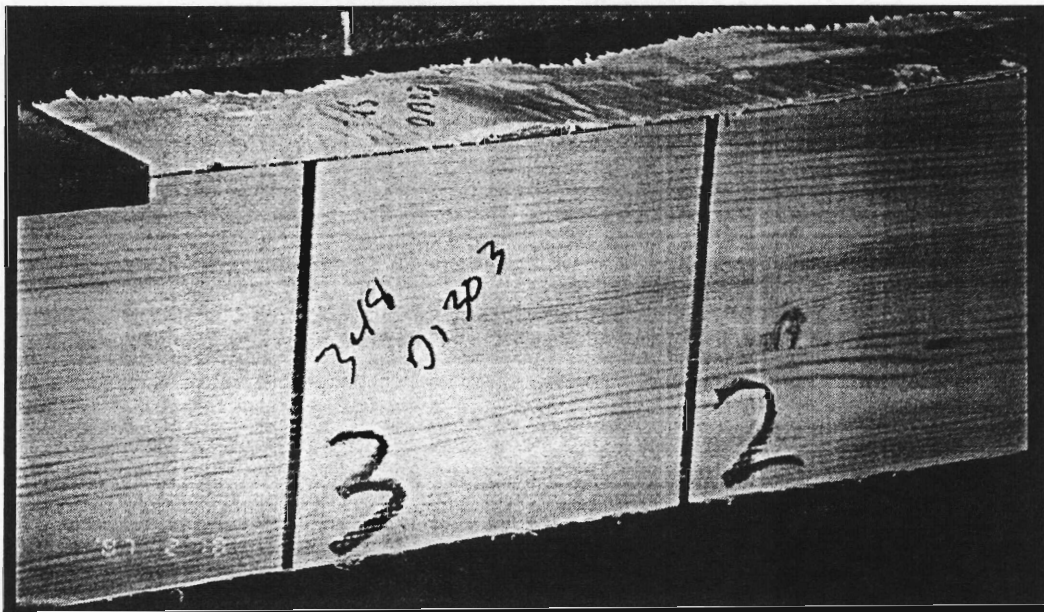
Photograph of buckling failure in compressive reinforcement.
